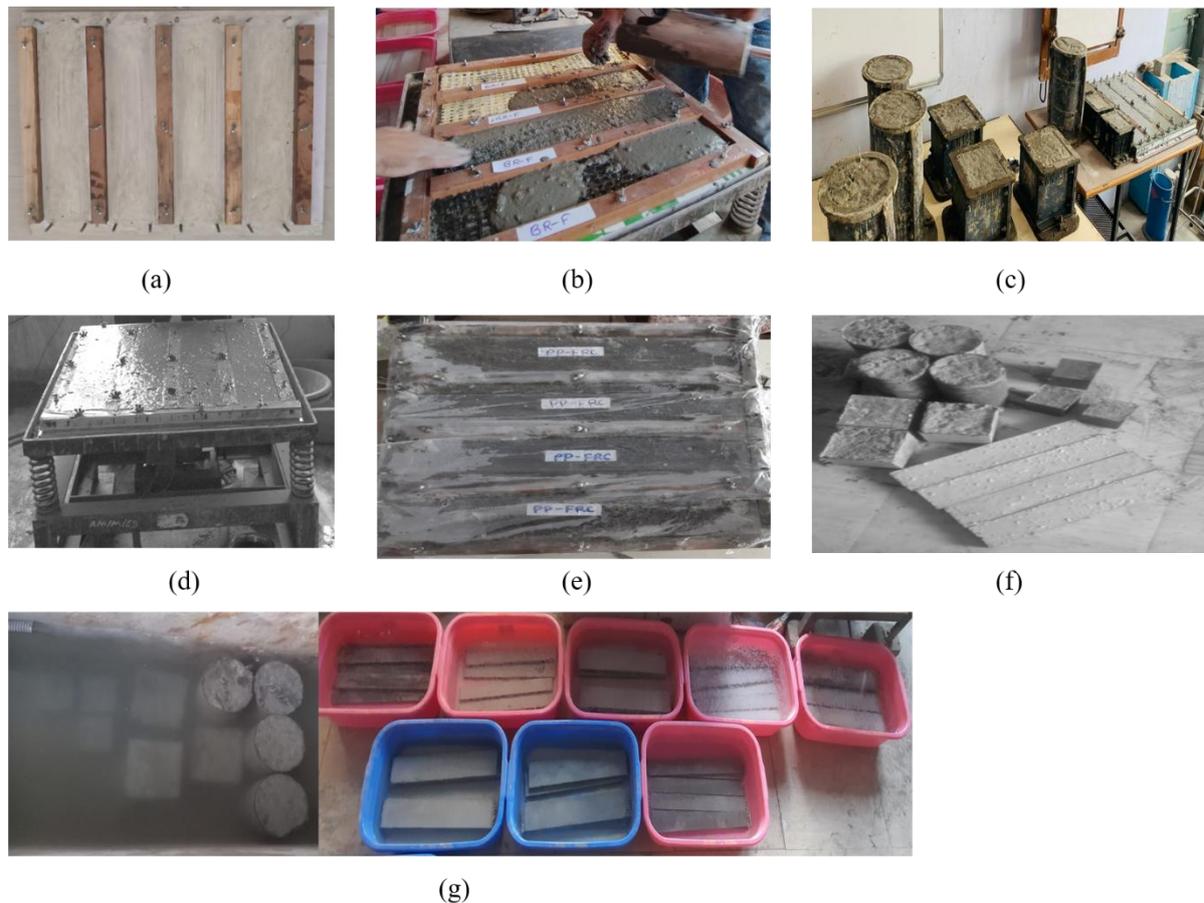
Casting of FRCM specimens: (a) Application of oil for easy release of concrete specimens from the mould during demoulding, (b) Placement of fabric layers in formwork followed by pouring of mortar, (c) Casting of cube, cylinder, and plate specimens, (d) Placing the mortar-filled mould on a vibrating table for proper compaction, (e) Covering the mortar-filled mould with a thin plastic sheet to prevent moisture loss and shrinkage, (f) Demoulding of concrete specimens from moulds after 24 hours of casting, (g) Placing concrete specimens in a water bath for curing.
